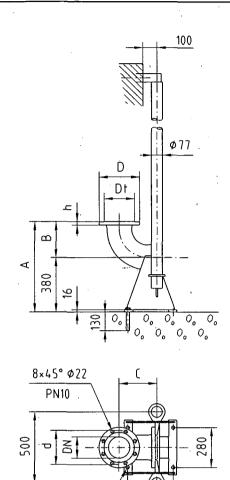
DN 150 and DN 150/200 guide rail system installation dimensions. The variable dimensions are given in table
